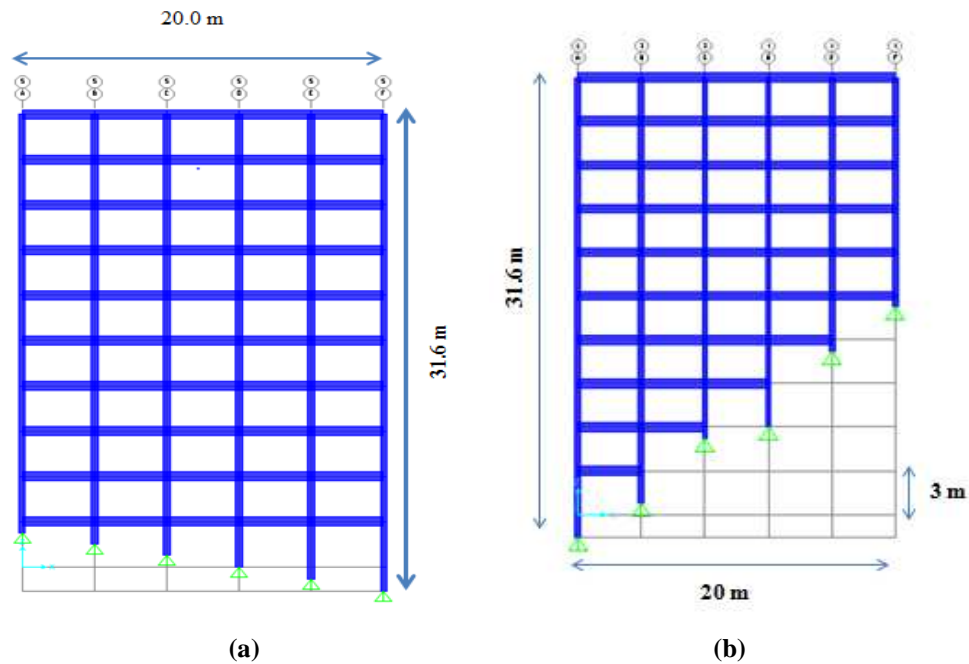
Building with Sloping Ground a) at Single Storey b) at Various Floors
